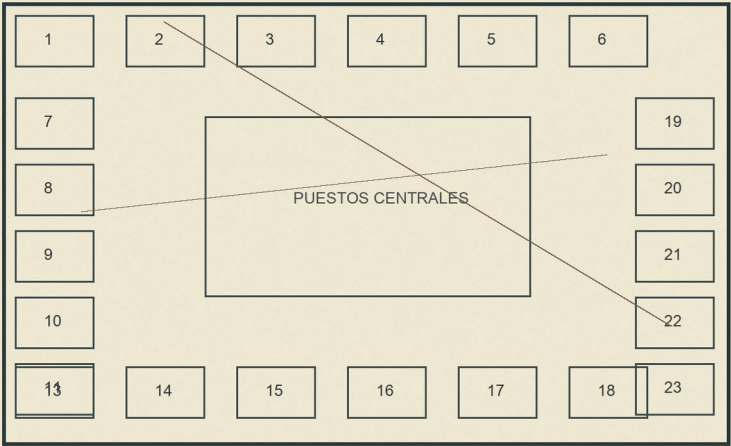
Reconstruction of the original floor plan, with 24 stalls and two main entrances. Sources: municipal plans and photographs.
